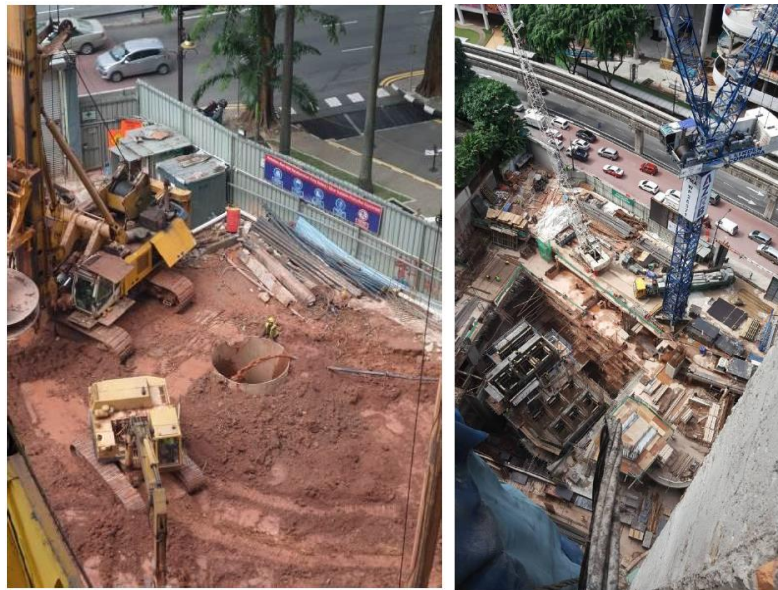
(Left) Large Diameter Foundation Piles Installation
